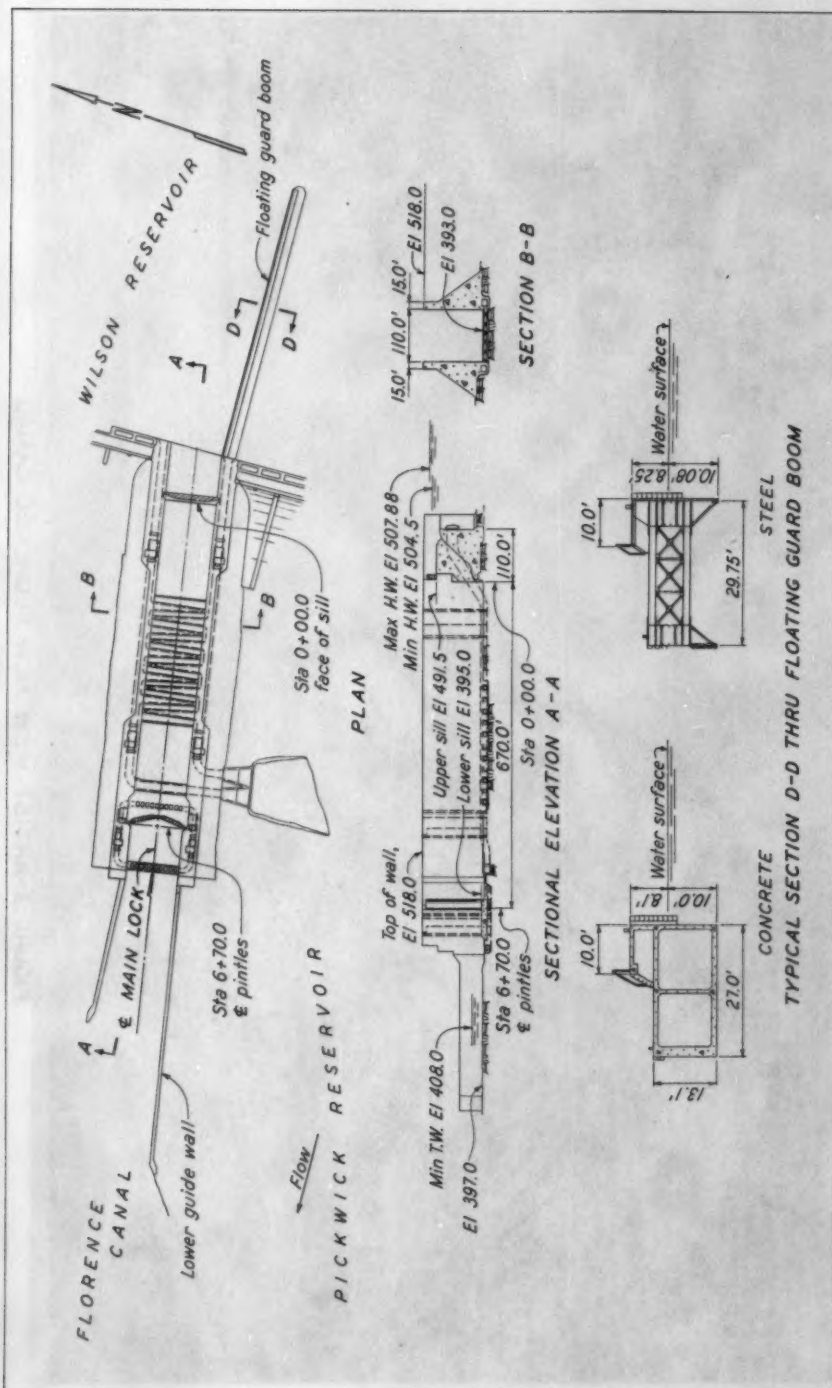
GENERAL PLAN NEW WILSON LOCK
